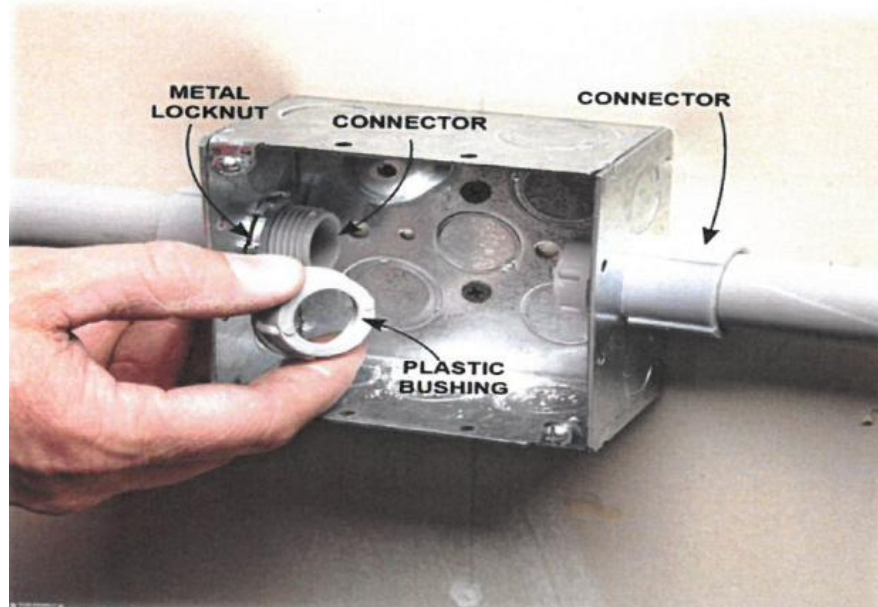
C (Sample Picture) Conduit Connection with Back Box
